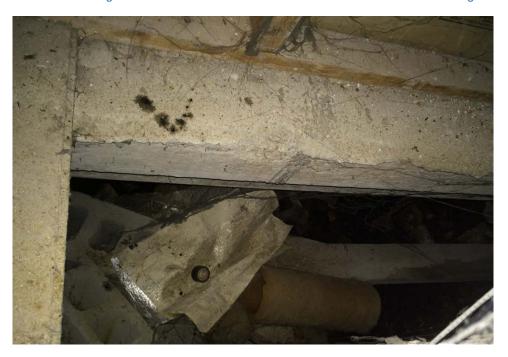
Looking down into large crawlspace, standing water is present below the debris.
